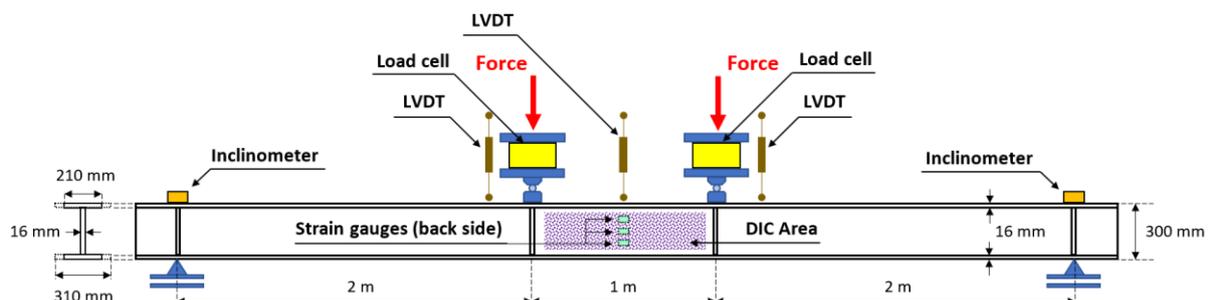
Dimensions of the test setup and arrangement of the measuring equipment
